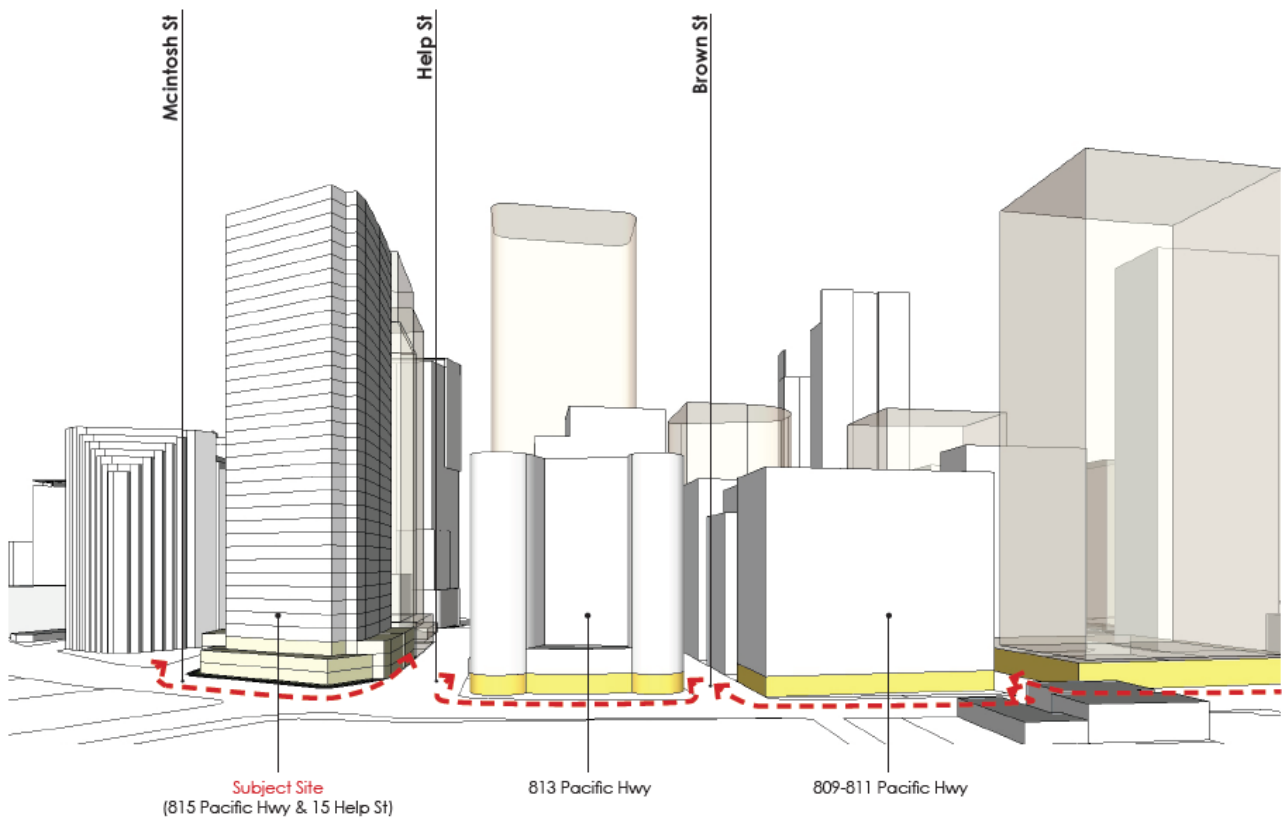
Proposed concept building envelope relative to the existing and proposed built environment in the Chatswood Commercial core (source: a+ Design Group)
